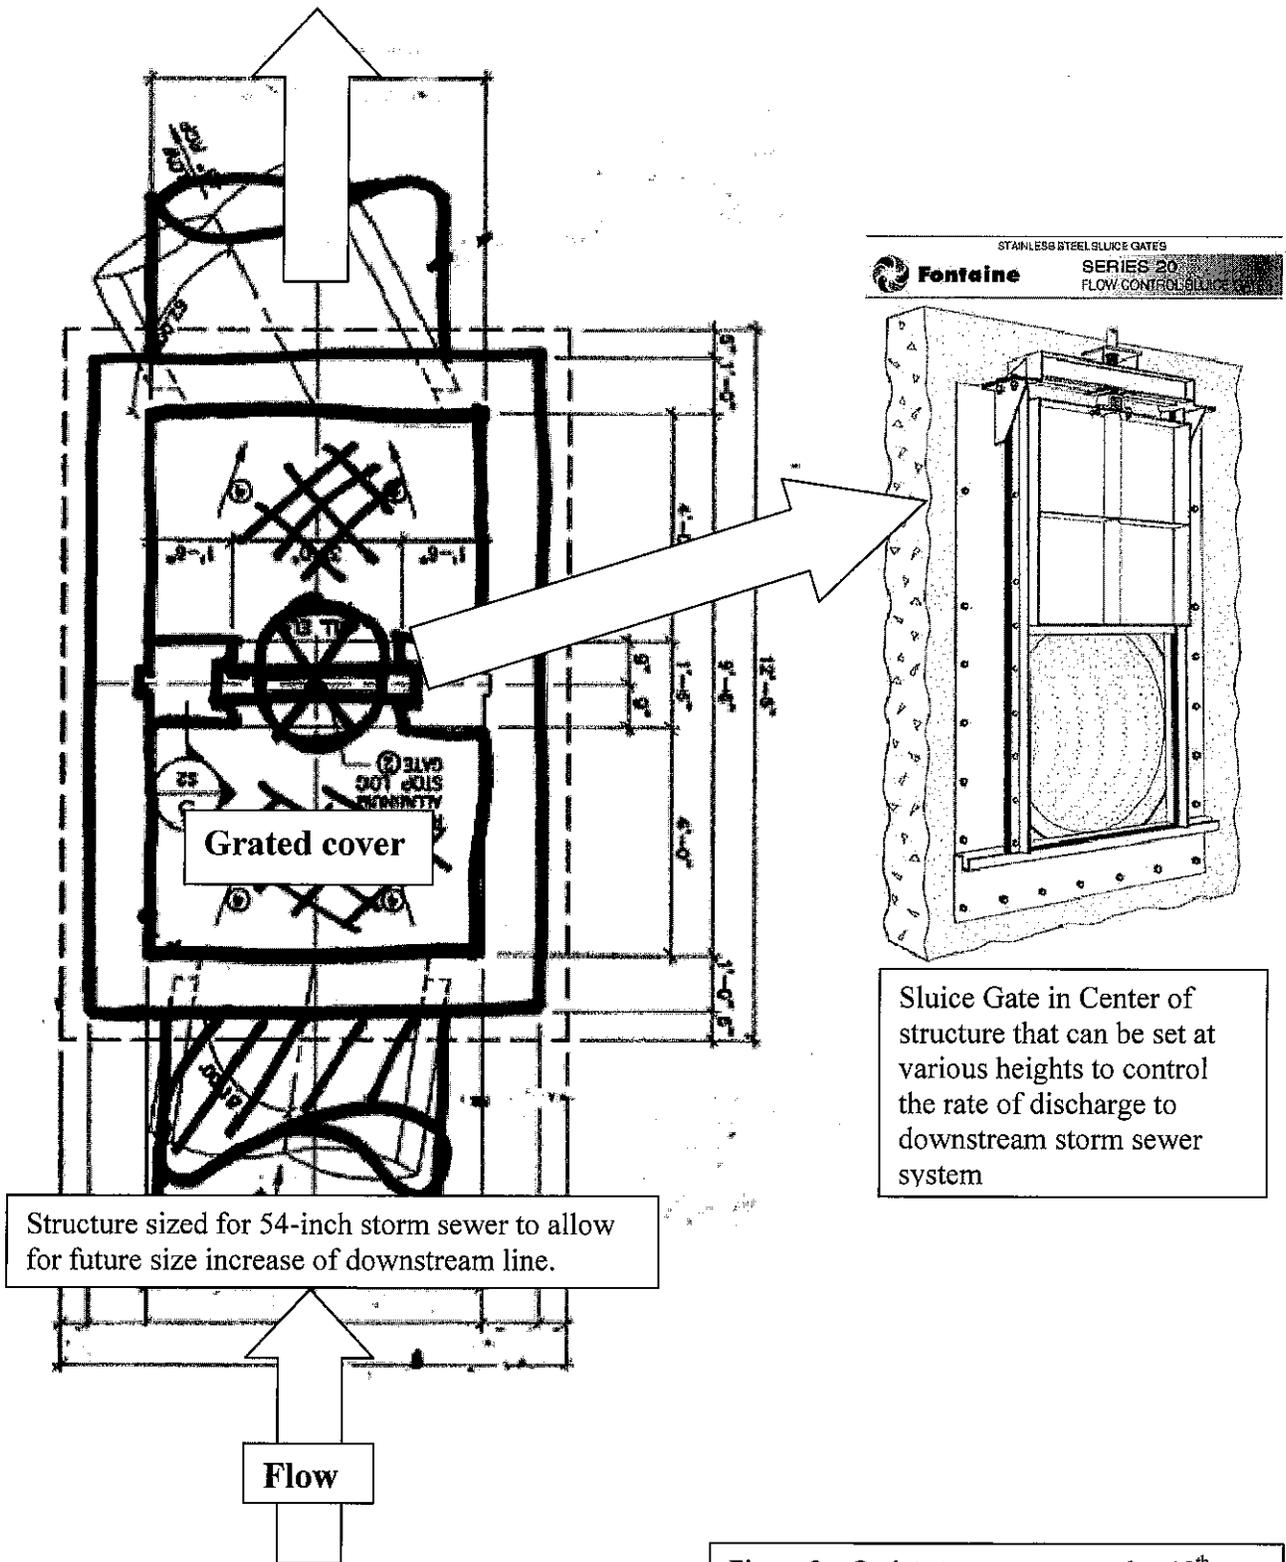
Outlet structure proposed at 18<sup>th</sup> Avenue and Red Leaf Court
